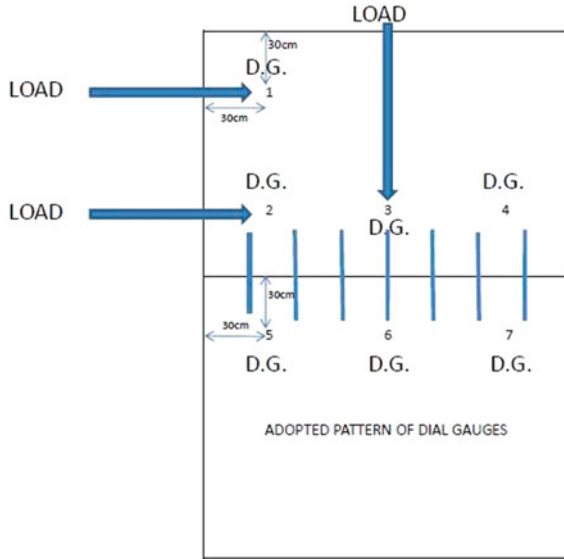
Schematic layout of plate load test conducted in the laboratory
